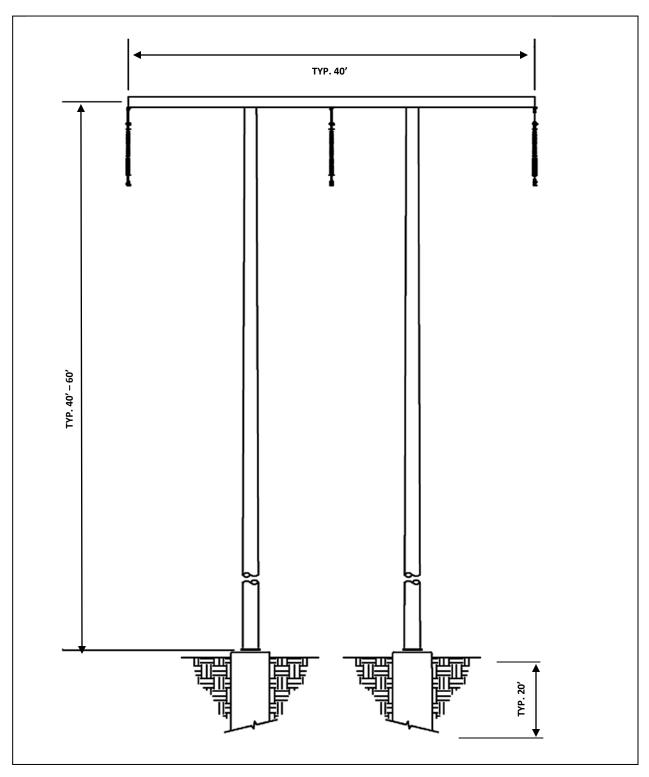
TYPICAL H-FRAME UNDERCROSSING STRUCTURE
